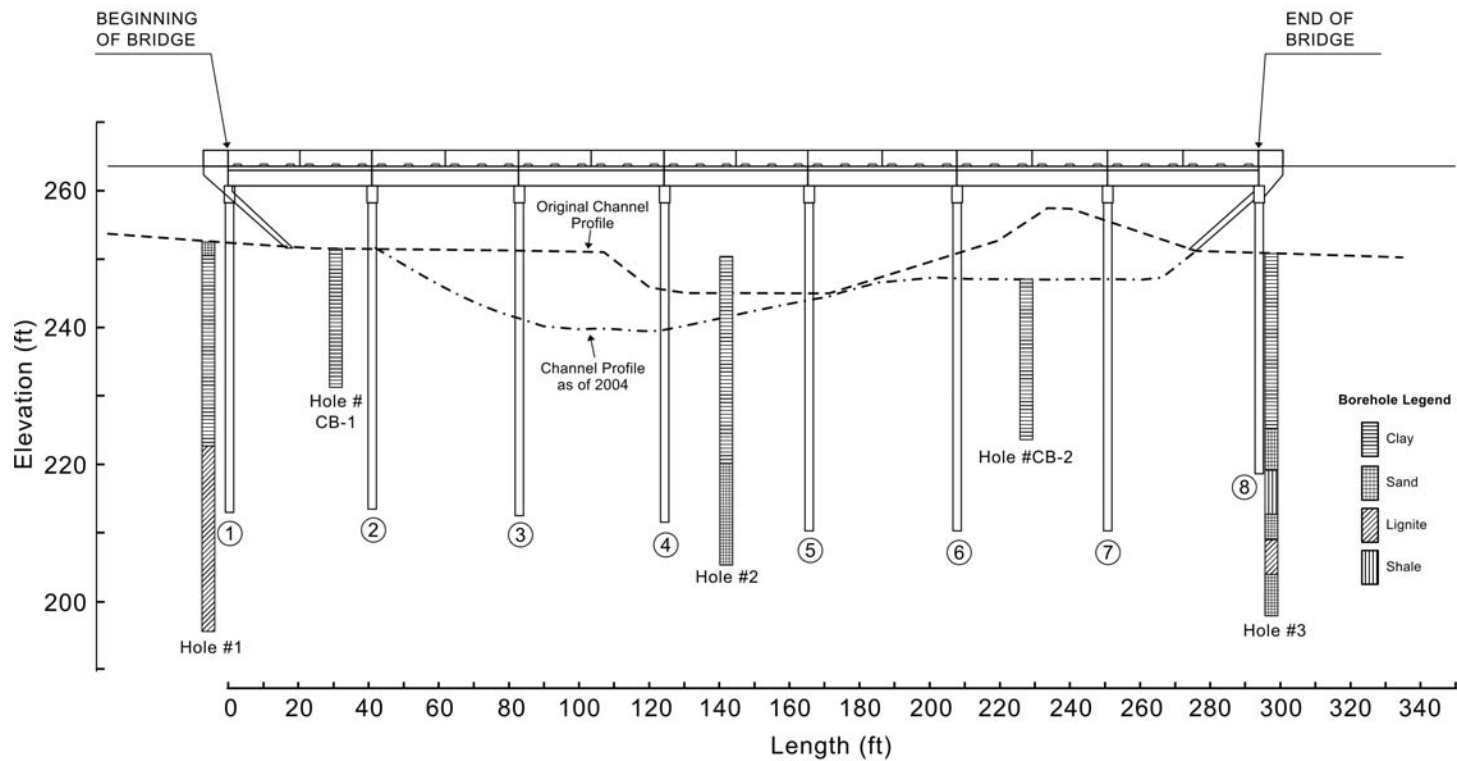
Case History No. 1 – Bridge Cross-Section.
